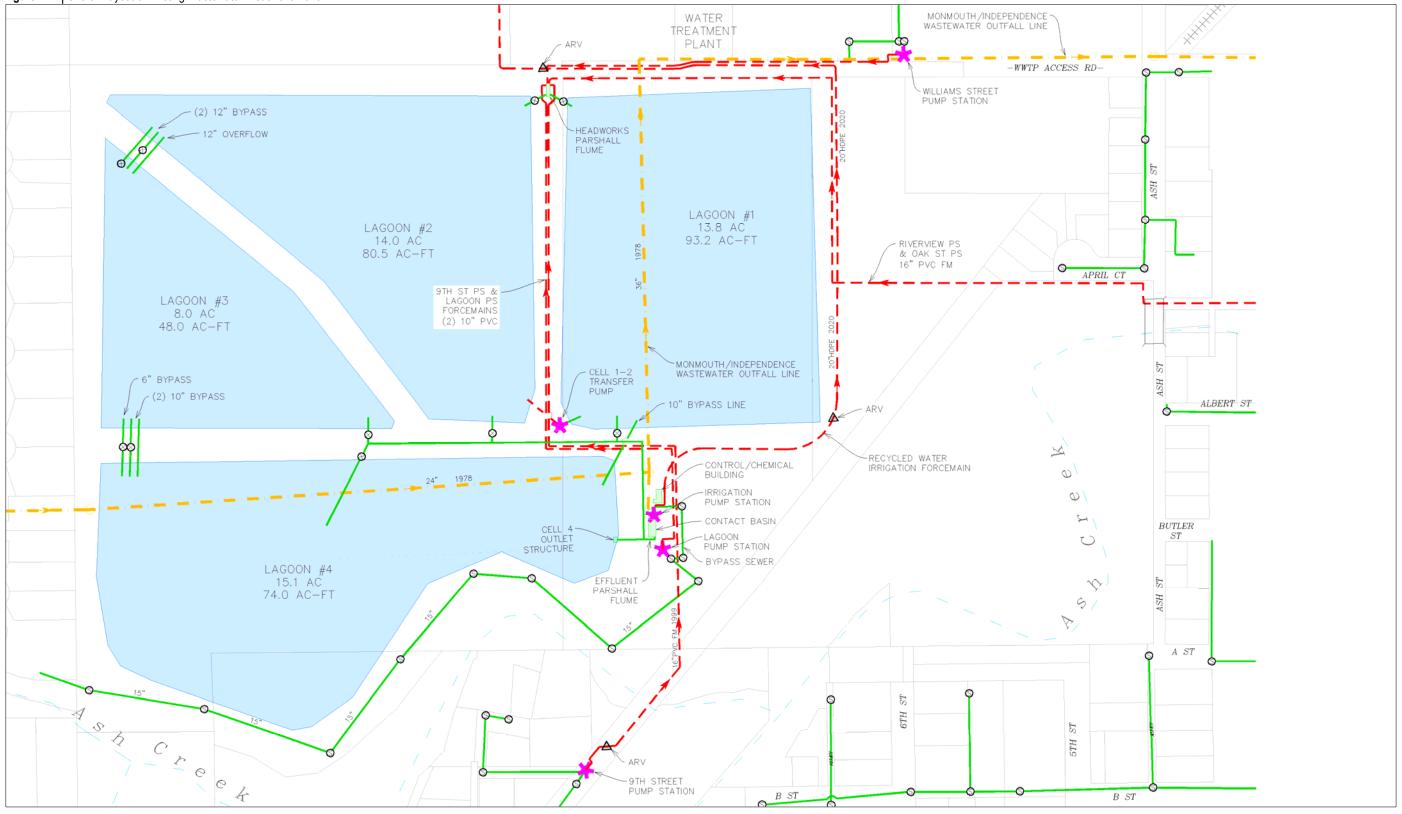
Overall Layout of Existing Wastewater Treatment Plant
